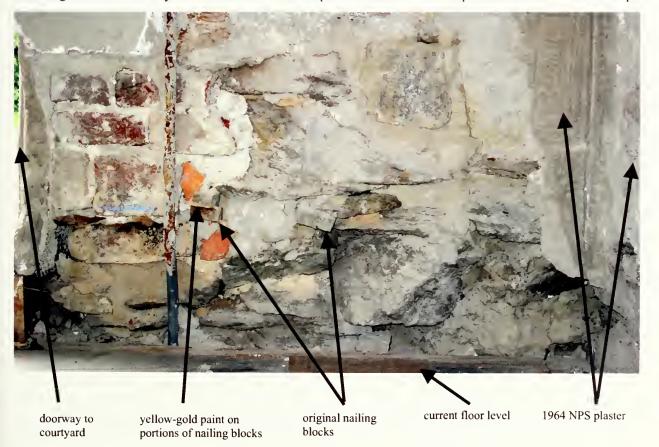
Center room, close up of west side of south wall, 2003. Showing nailers embedded in original plaster.
